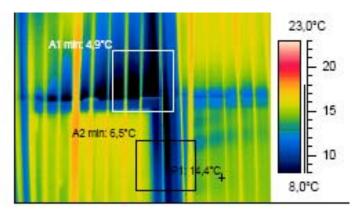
Inside view of the barrack building external wall. Air leakage through windows identified by fan-depressurization test.
